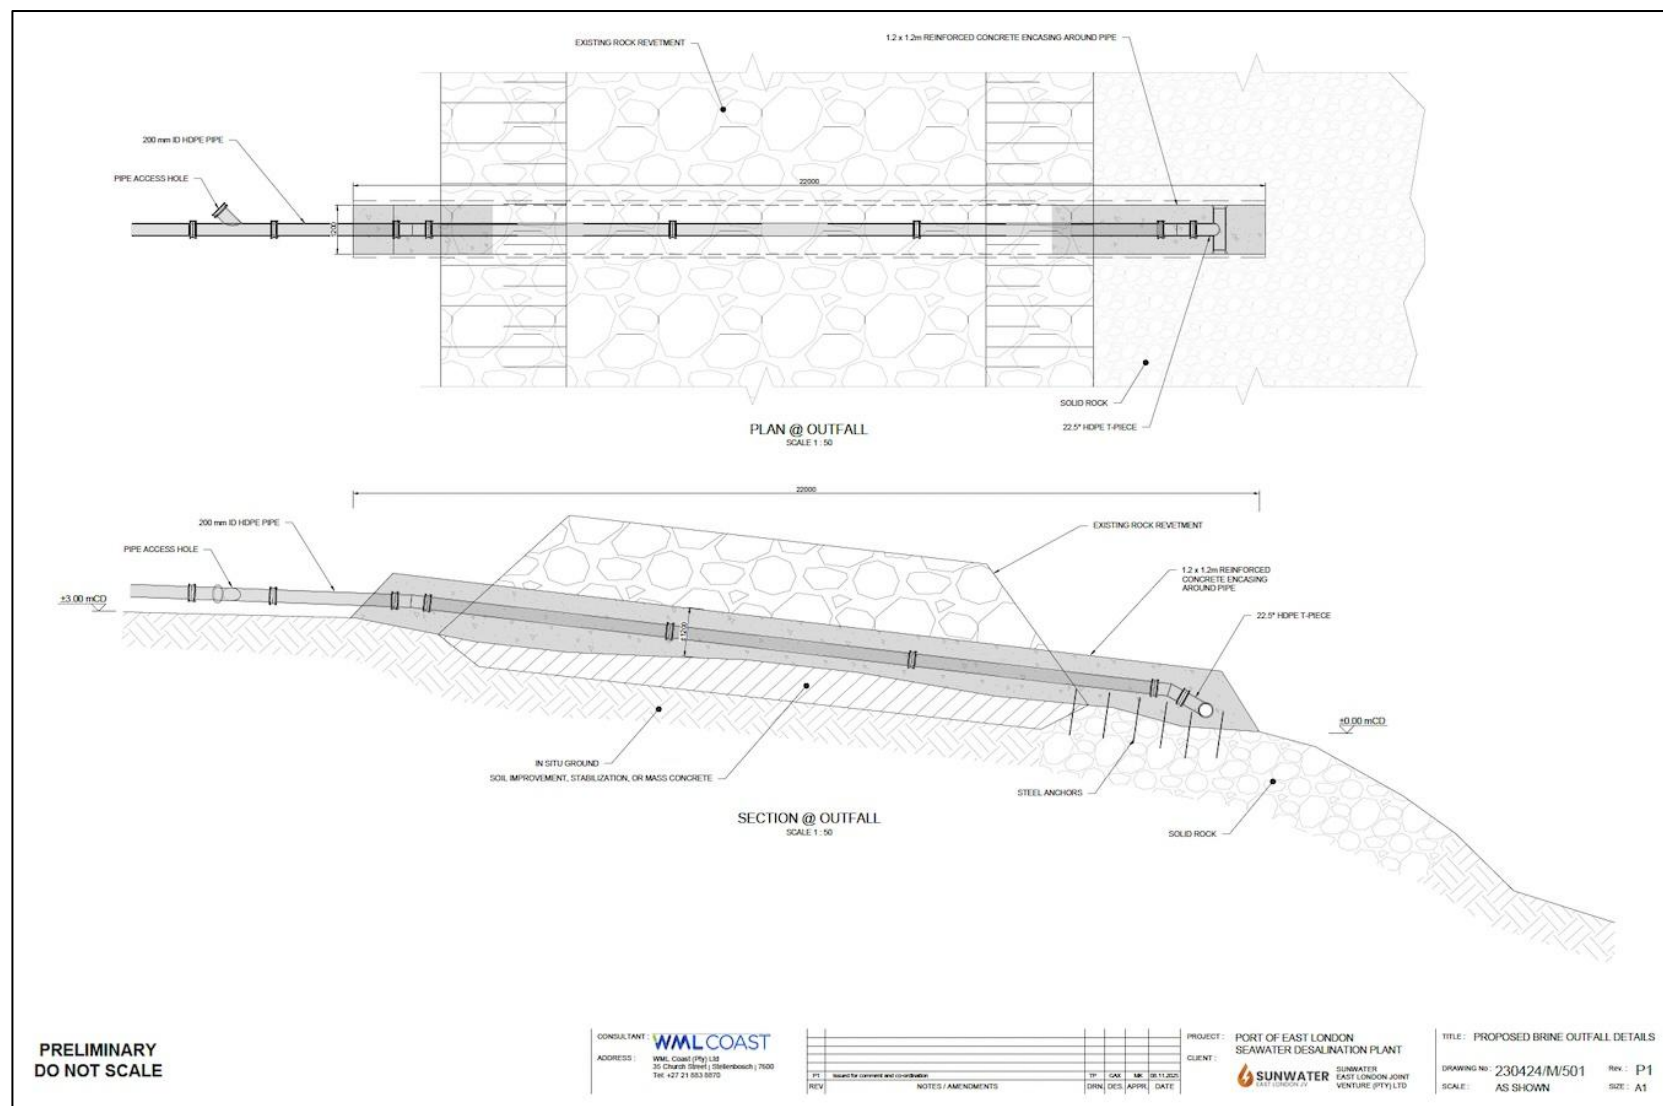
Proposed brine outfall detail (Source: Anchor Environmental).
